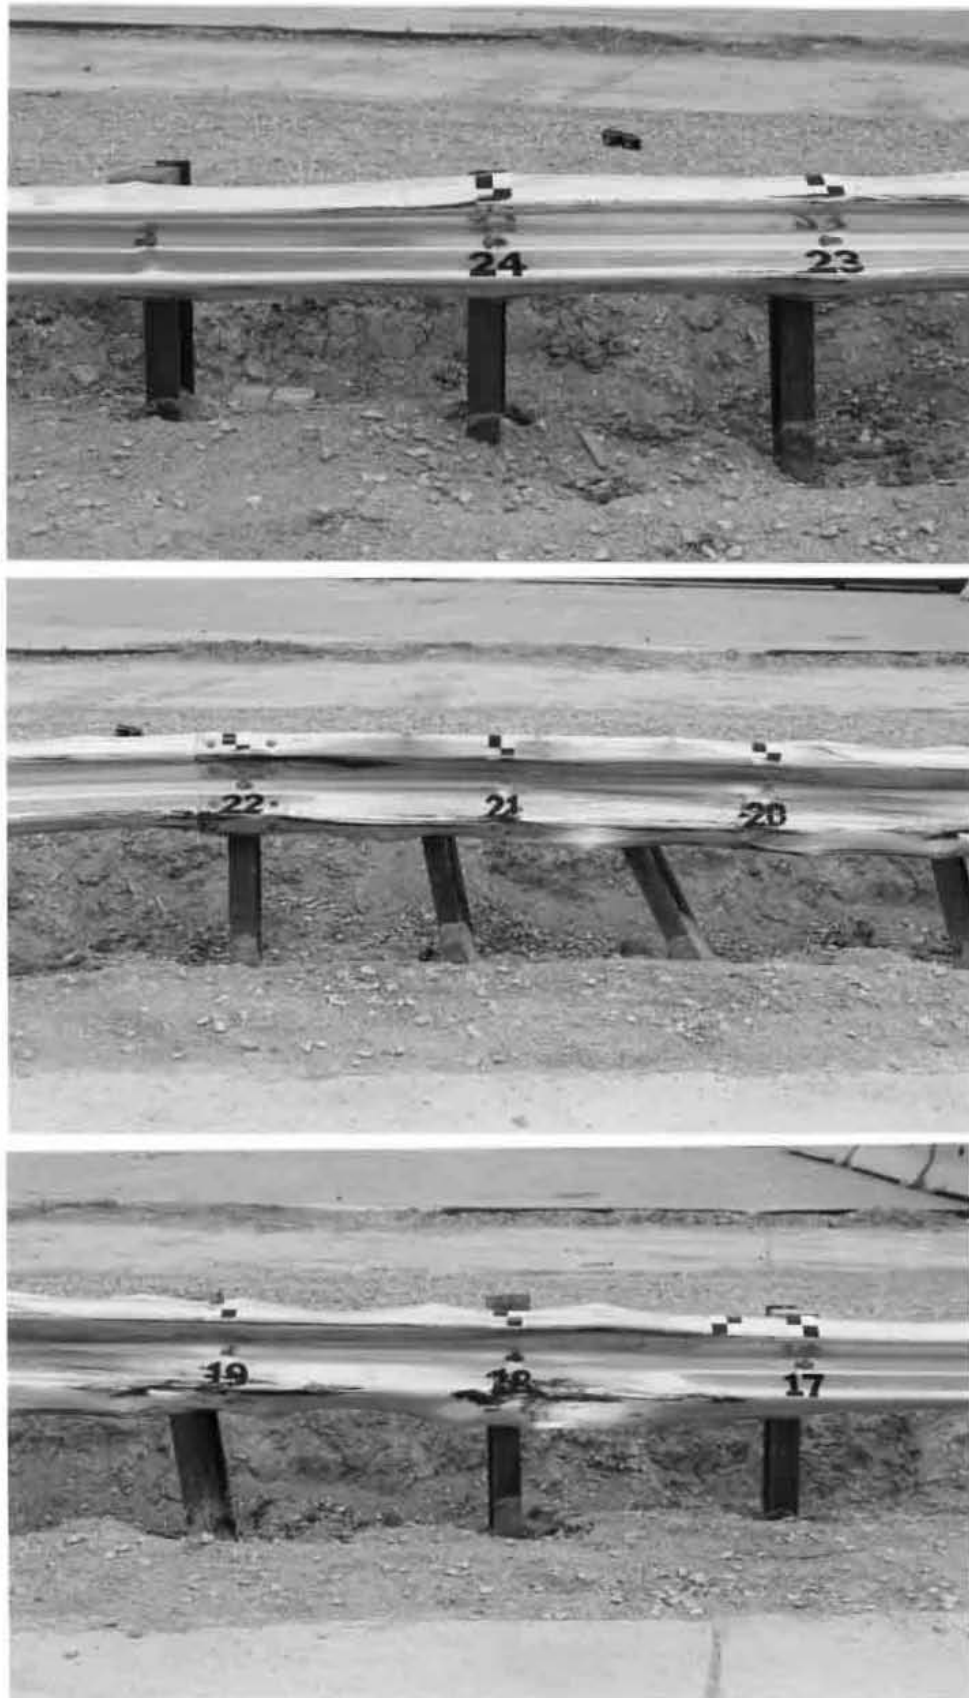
W-beam Guardrail System Damage, Test MOSW-1
